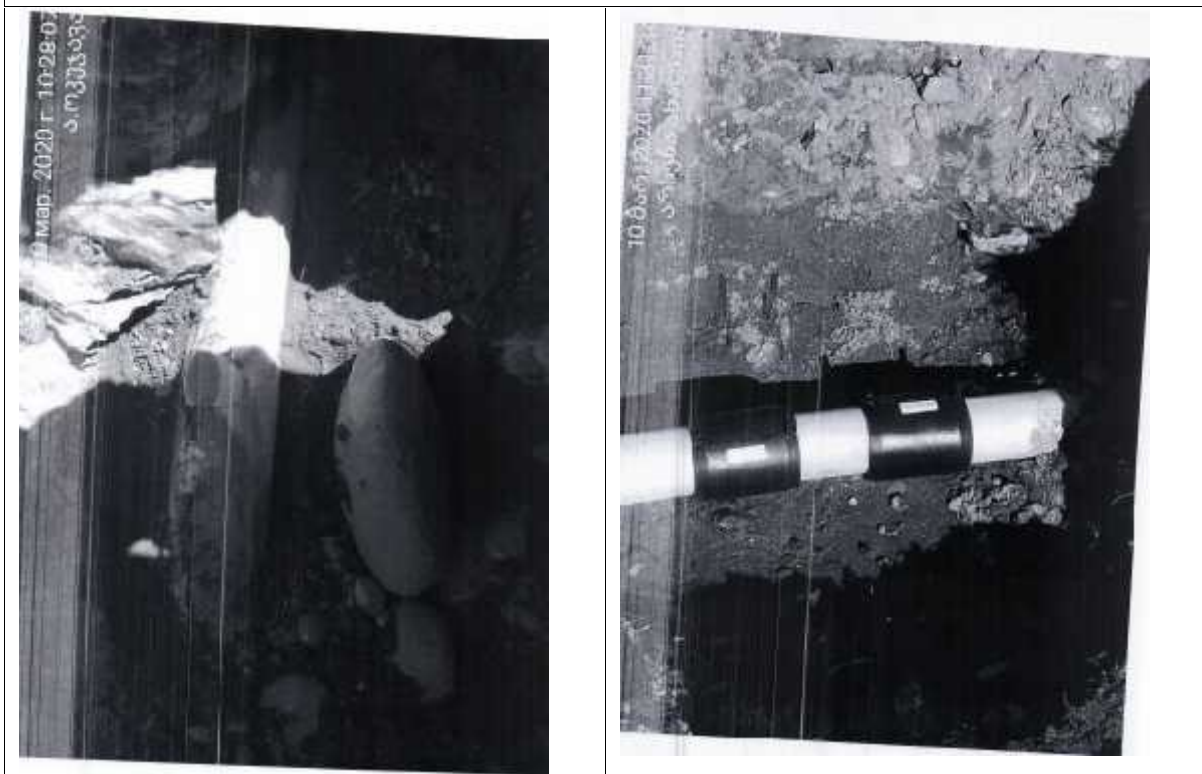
Damaged underground infrastructure and the same section after rehabilitation – Kedia Str.
